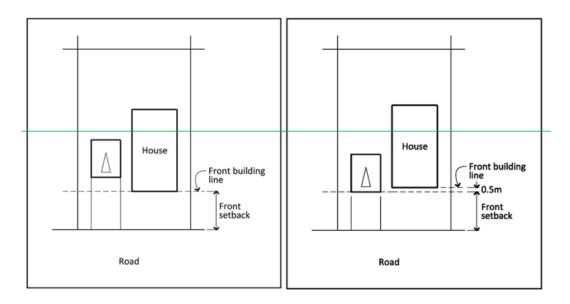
Setback for accessory buildings – example of a detached accessory building
